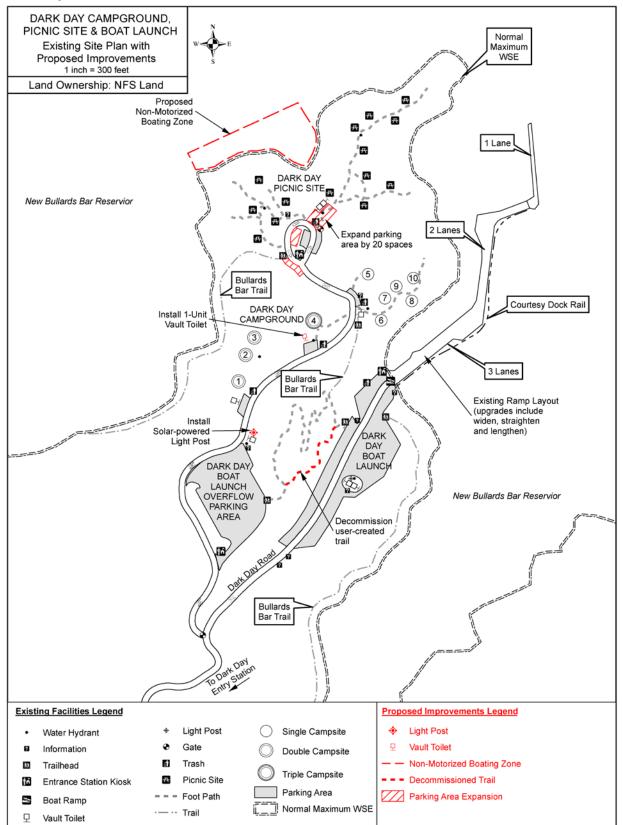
Existing site plan with proposed improvements for Dark Day Campground, Picnic Site and Boat Launch.
